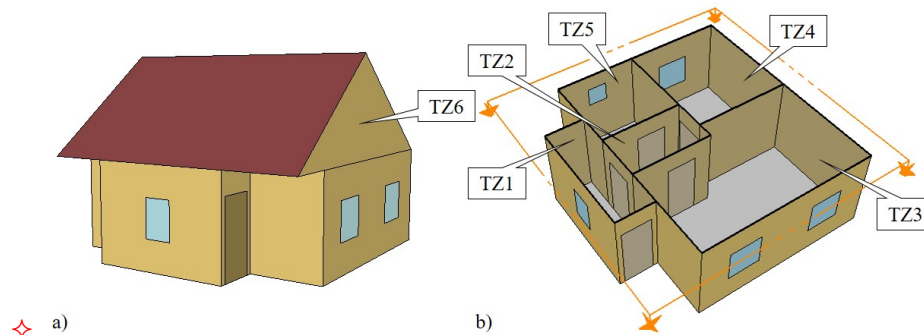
3D model of the TSCC (a) and room layout (b): TZ1 – Hall 1, TZ2 – Hall 2, TZ3 – Multifunctional room (Living room, Kitchen, Dining room, Bedroom), TZ4 – Children's room, TZ5 – Bathroom, TZ6 – Attic.
